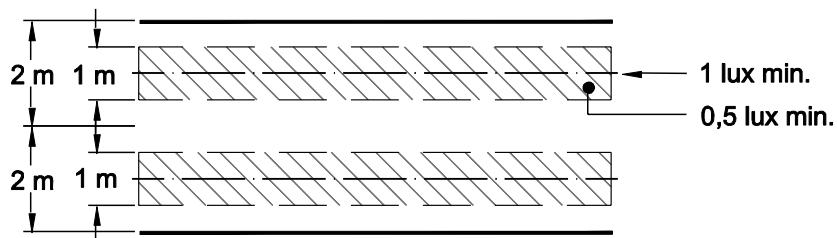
4 m wide defined escape route treated as two 2 m wide strips
